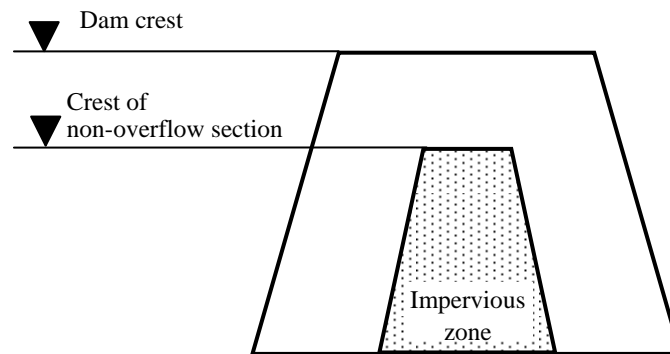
Crest of Non-overflow Section of Fill Dam
